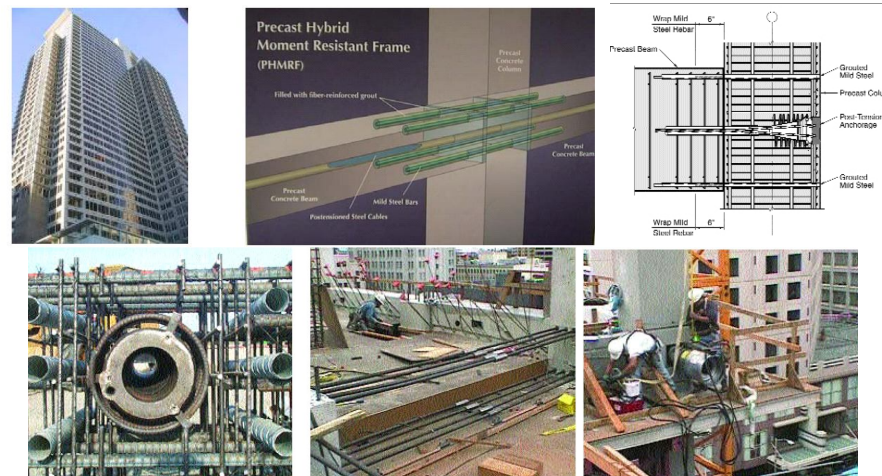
Paramount Building, 39-storey building, San Francisco [3,13]
